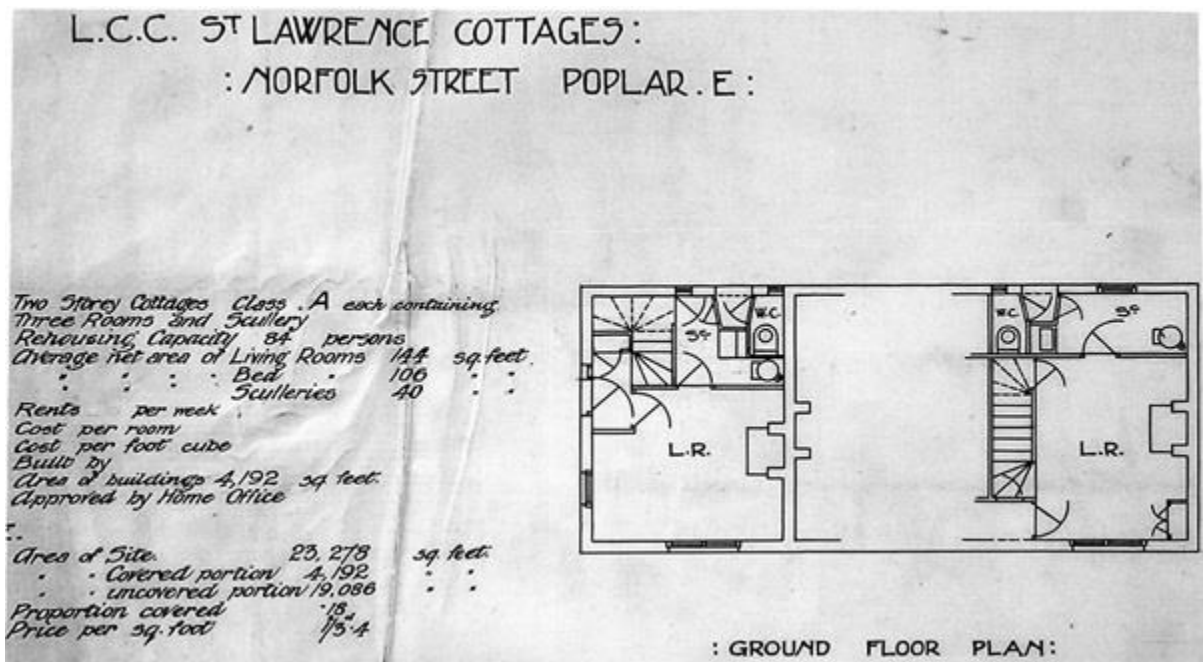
Ground floor plan of St Lawrence Cottages (LMA ref: LCC/AR/HS/03/059)
